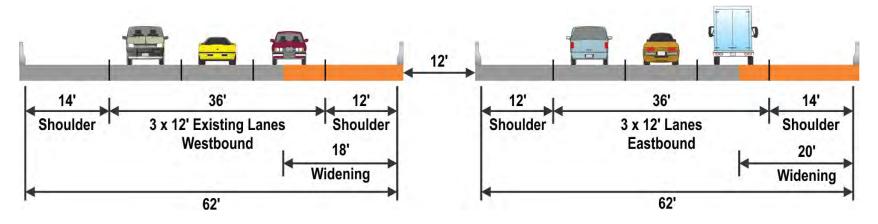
Existing Willoughby Bay Bridge Typical Section Looking Eastbound
